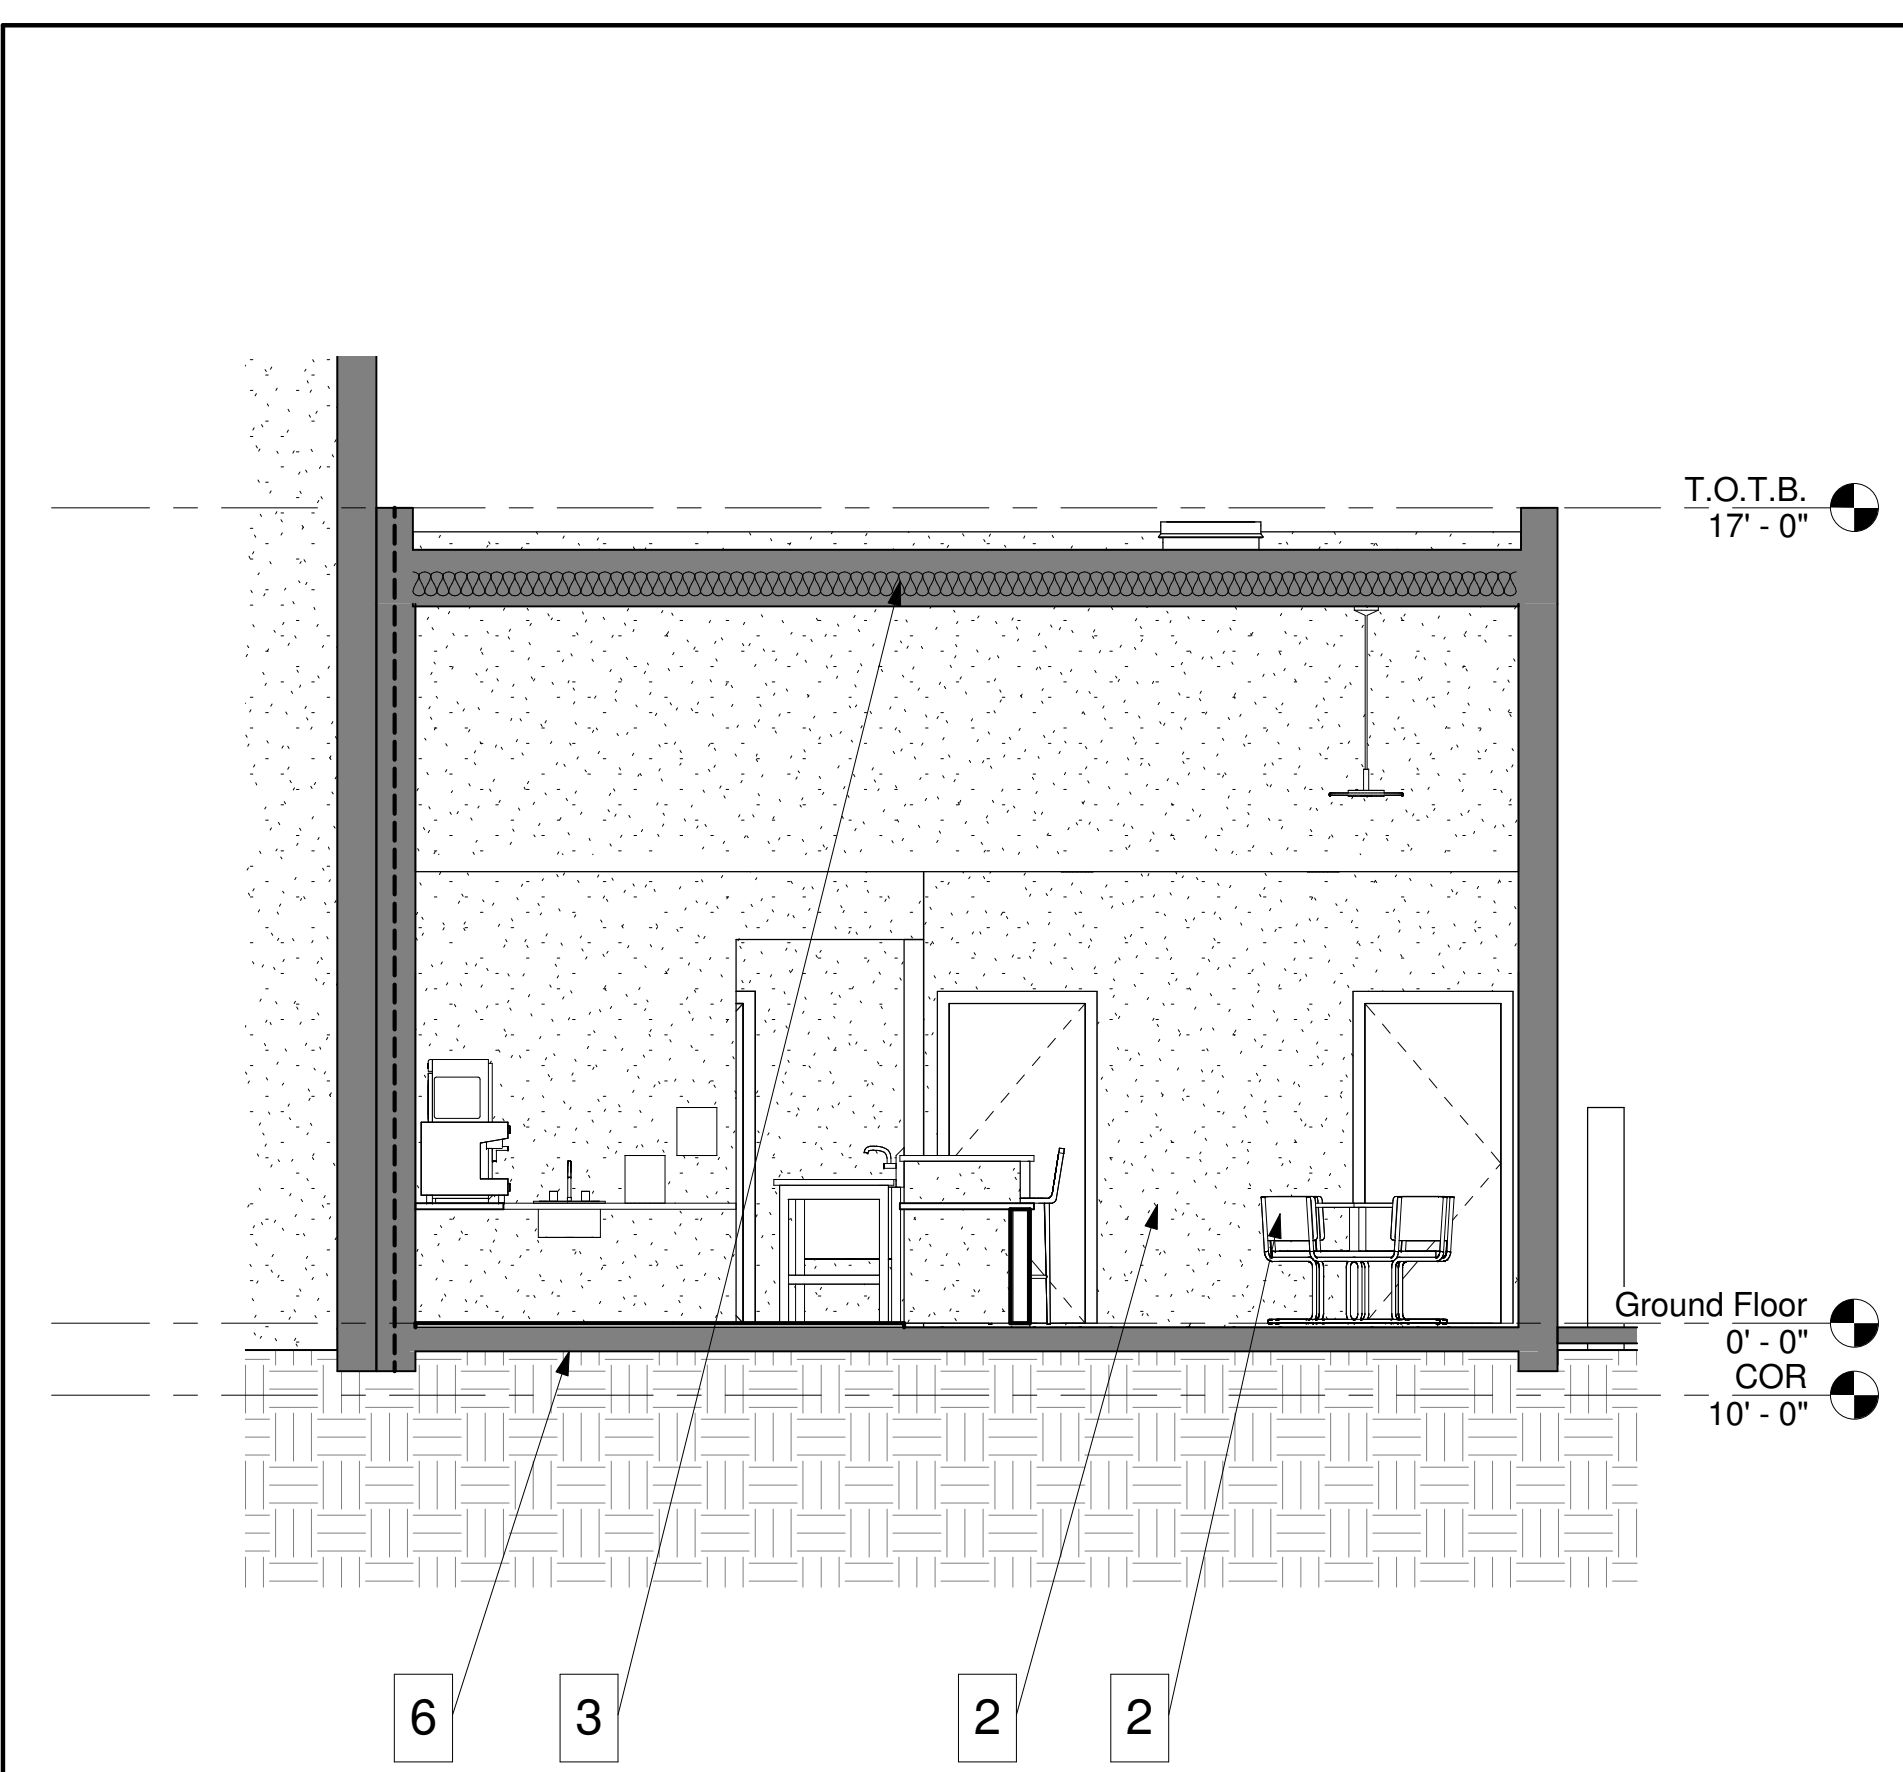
Scale: 1/4" = 1'-0" Section 1
